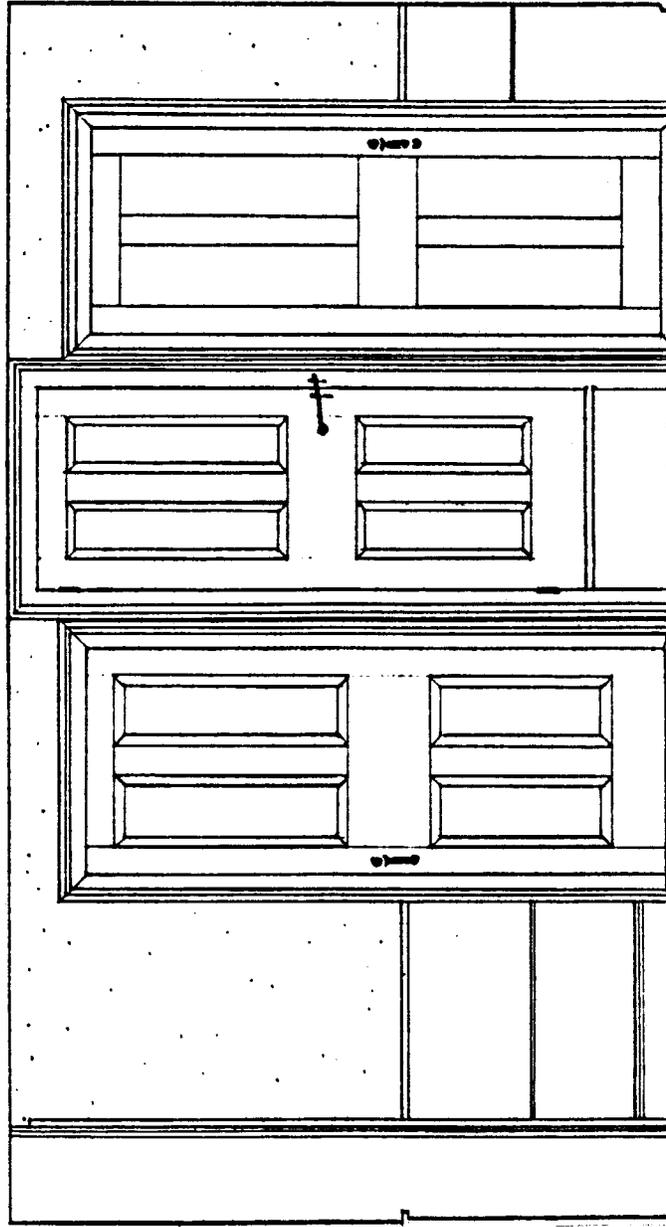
Atwood-Higgins House: West Kitchen, West Wall.
